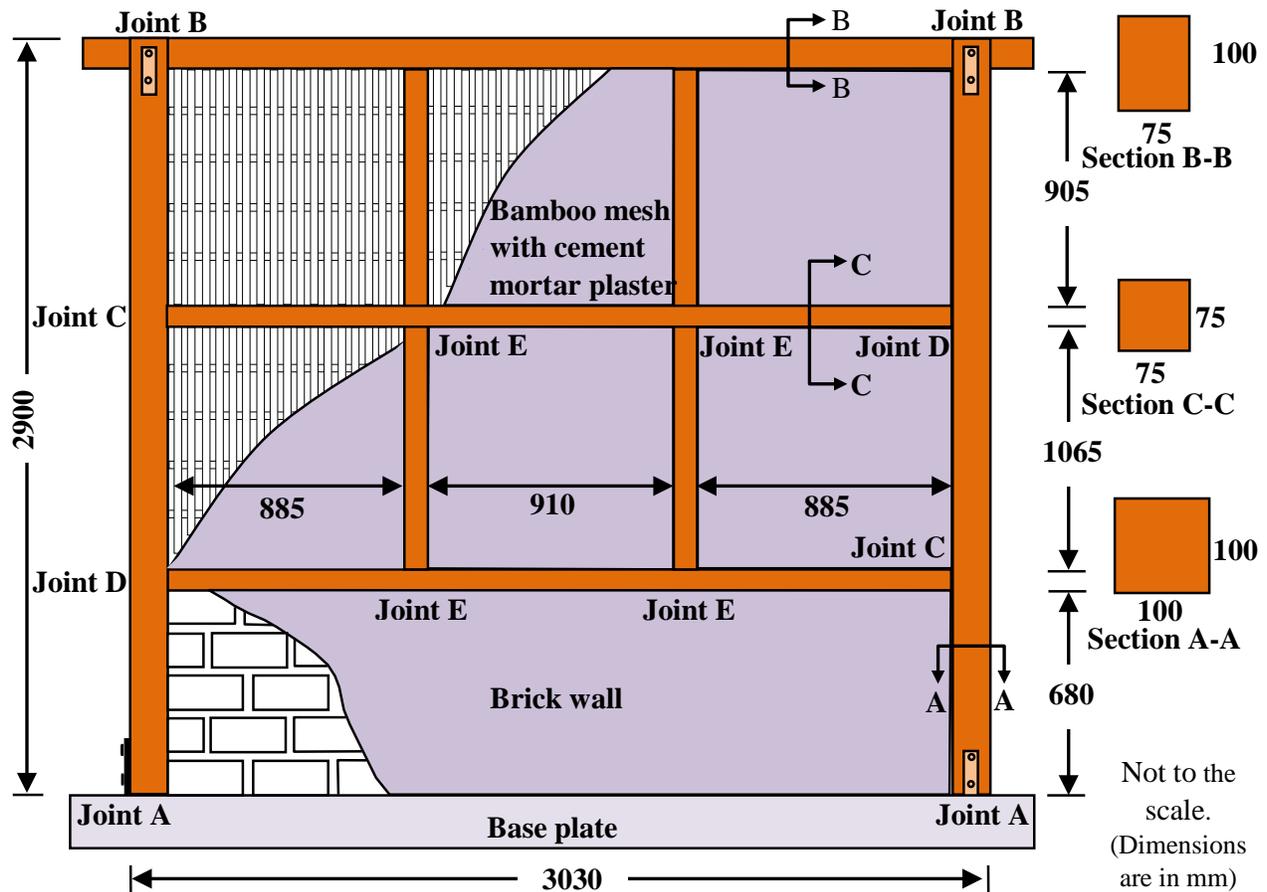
Details of member sizes and types of connections used in Assam-type frame specimens
